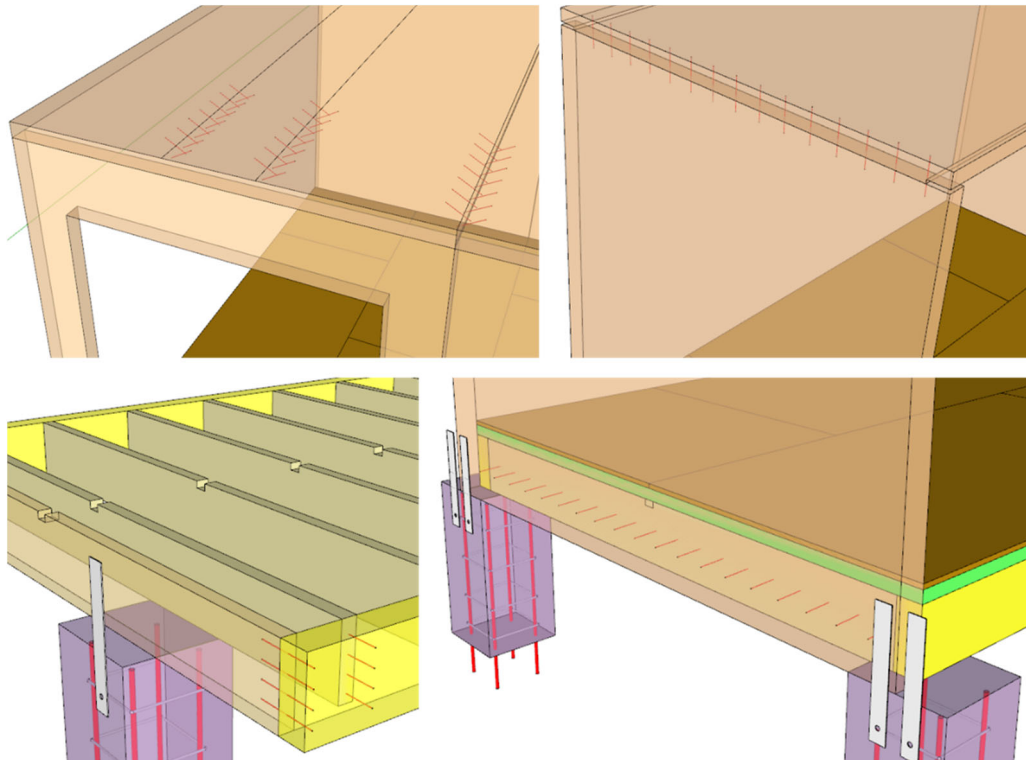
3D drawings: Floor joist, Wall panel, roof connections
